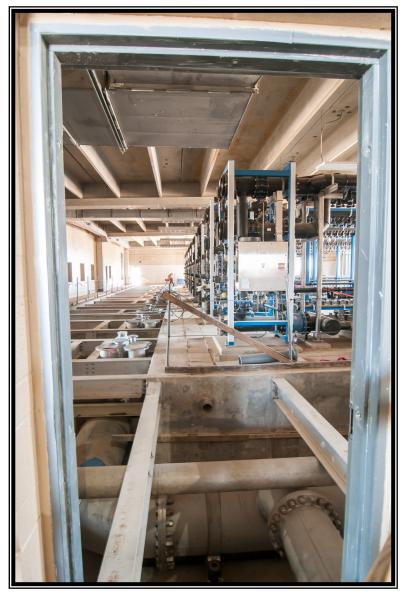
Surface Water Facilities (SWF) Construction Photos
